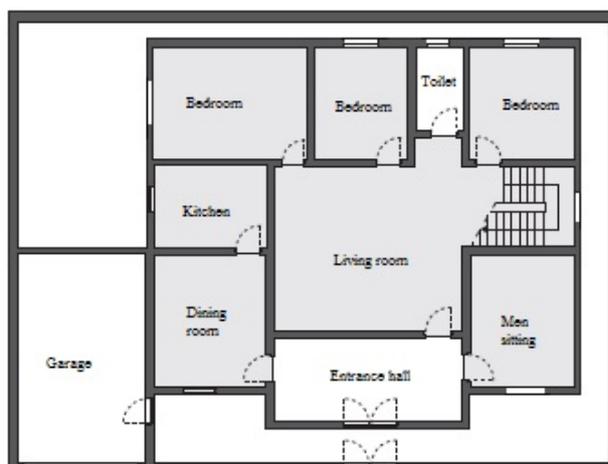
A plan of a house in the transitional period shows the setbacks around the house.
